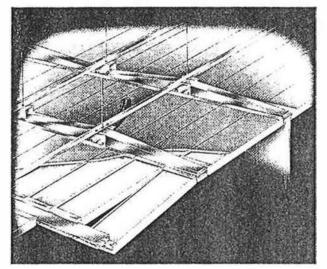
Ceiling as panel module ceiling with partition connection (25)
